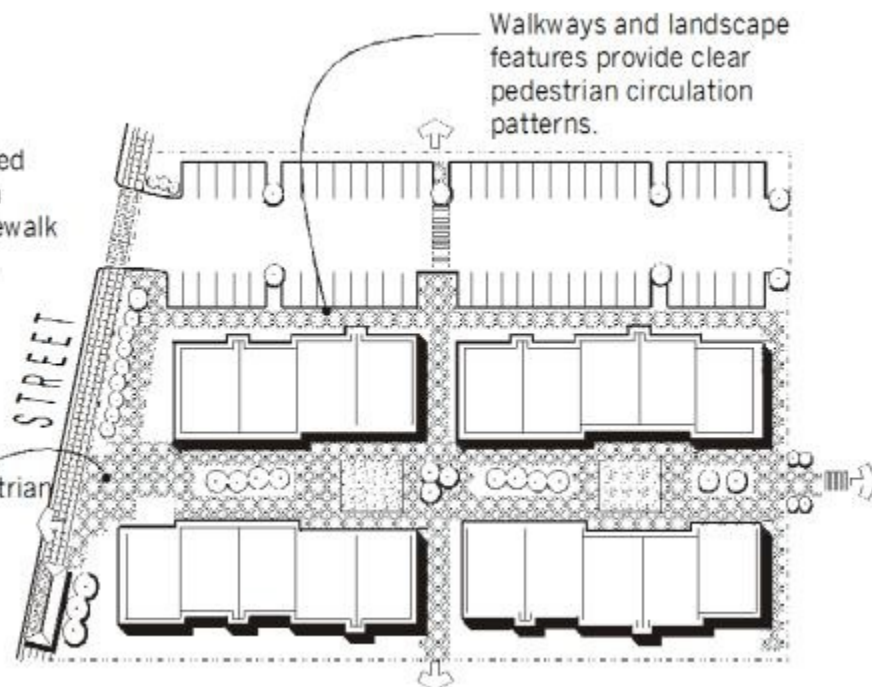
(D): Avoid parking that dominates the site. Encourage parking located behind or on the side of buildings and common open space between buildings.
